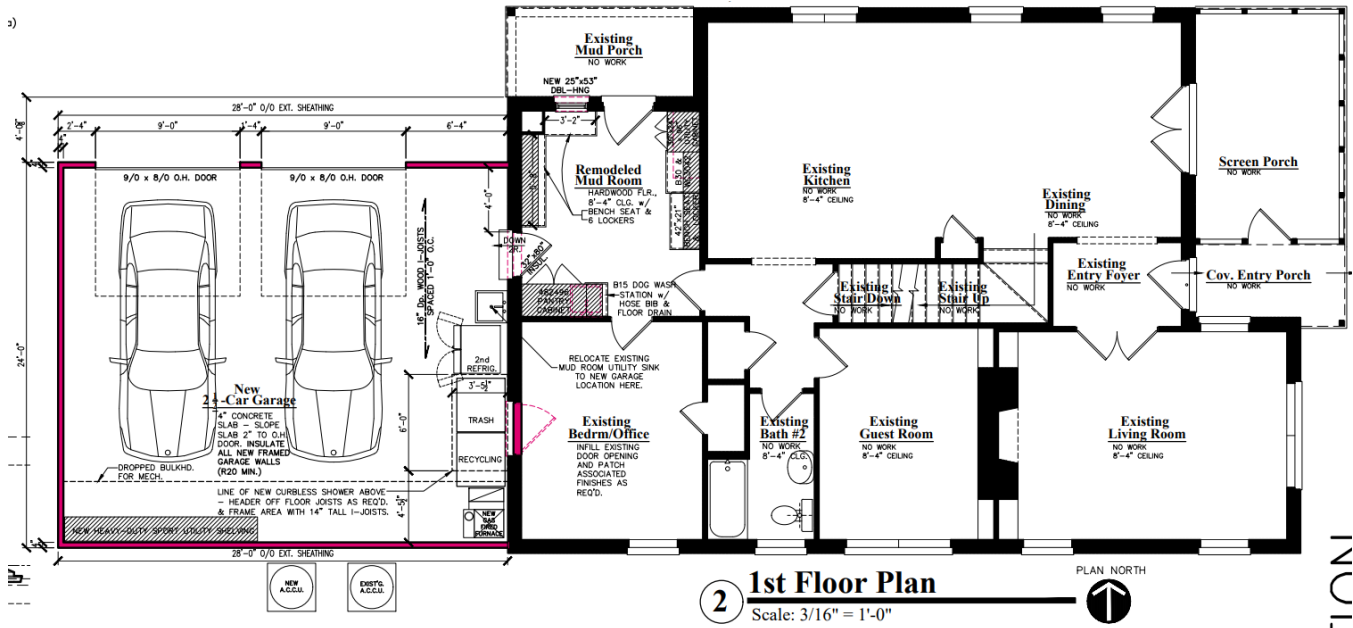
Floor plan of 1<sup>st</sup> floor.
